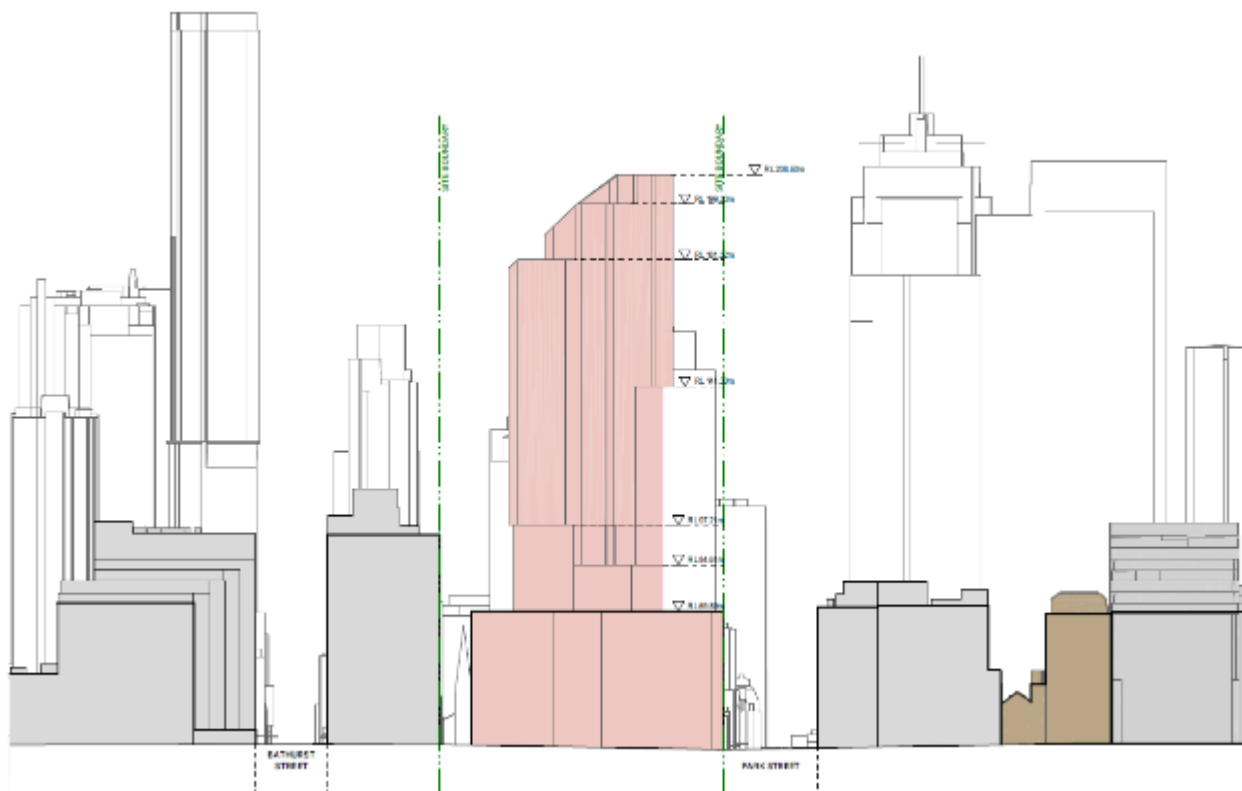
| Proposed east elevation – Elizabeth Street (Source: Ethos Urban modification plans)
